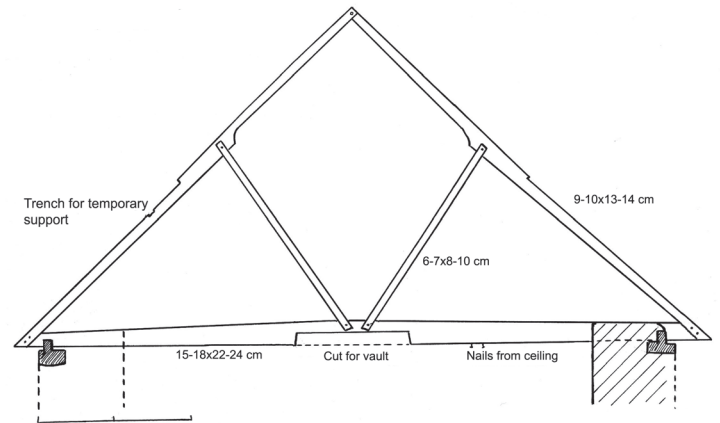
Forshem, nave roof truss, view from west. Drawing by the author.
